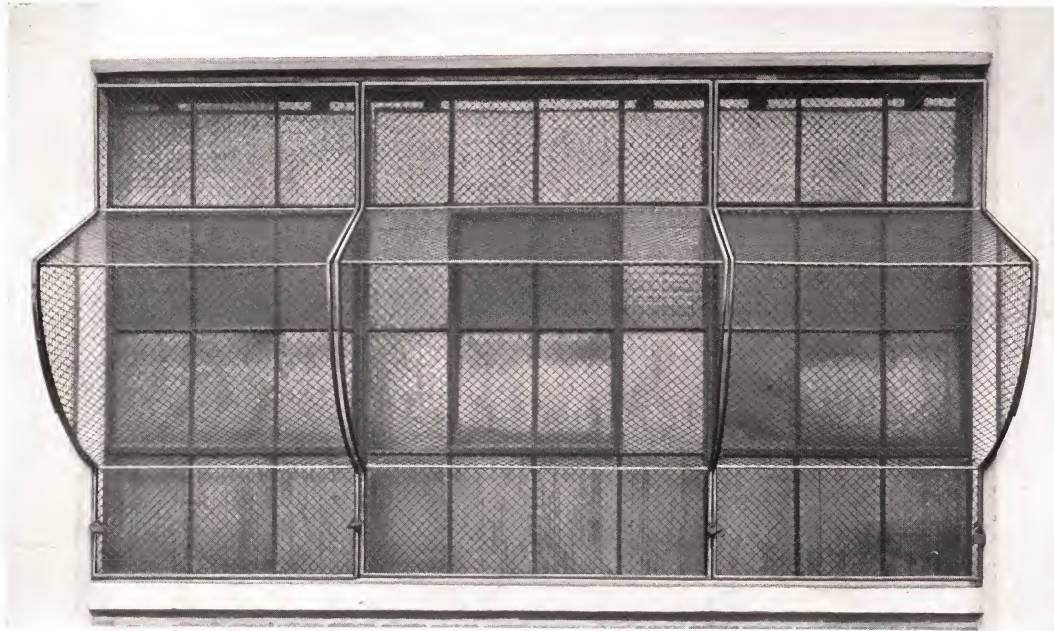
Horrocks Wire Window Guards at the plant of Yale & Towne, Stamford, Conn. Guards are so shaped to permit windows to swing out on pivoted metal sash.
